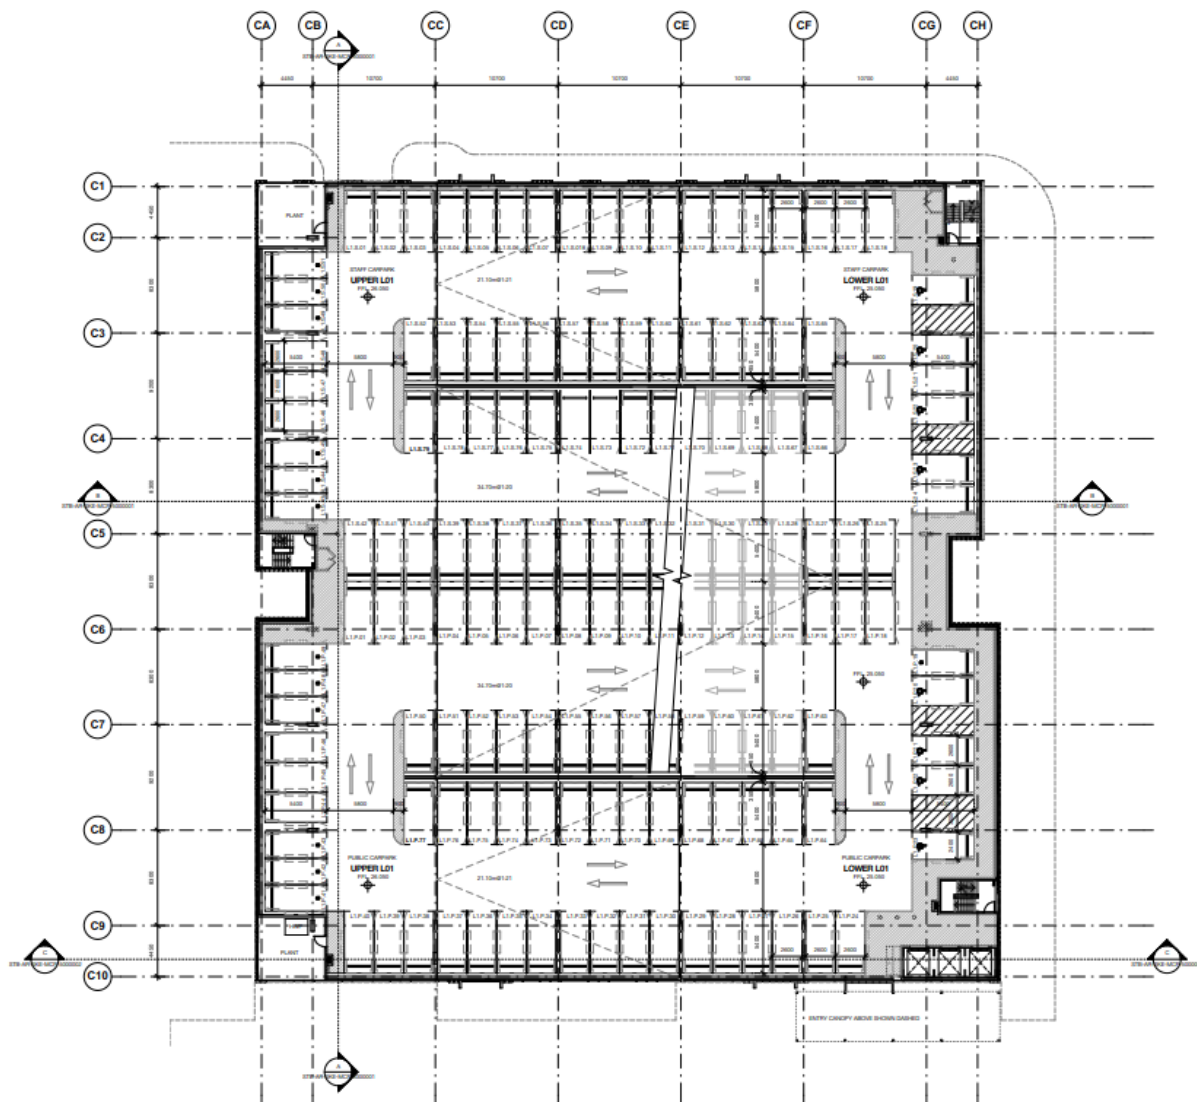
Typical floor of proposed Multideck Carpark
